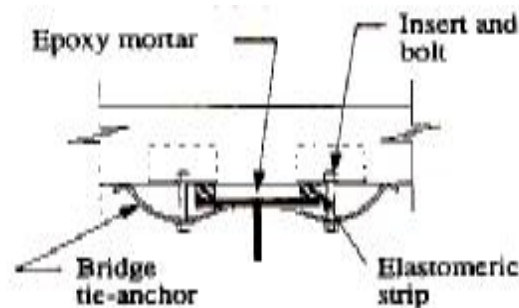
Connection detail of Clark's Summit Bridge
